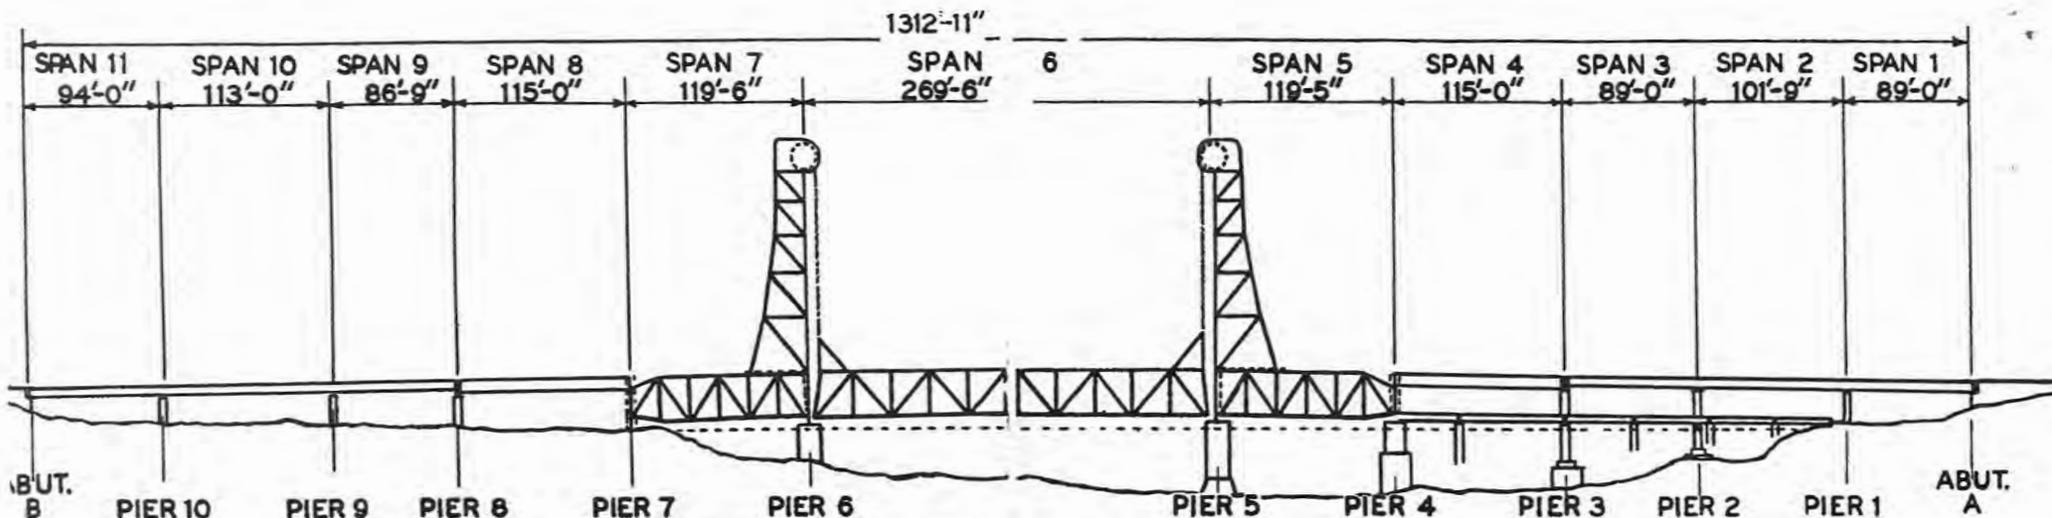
General elevation of double-deck lift bridge being built between Houghton and Hancock, Michigan.
